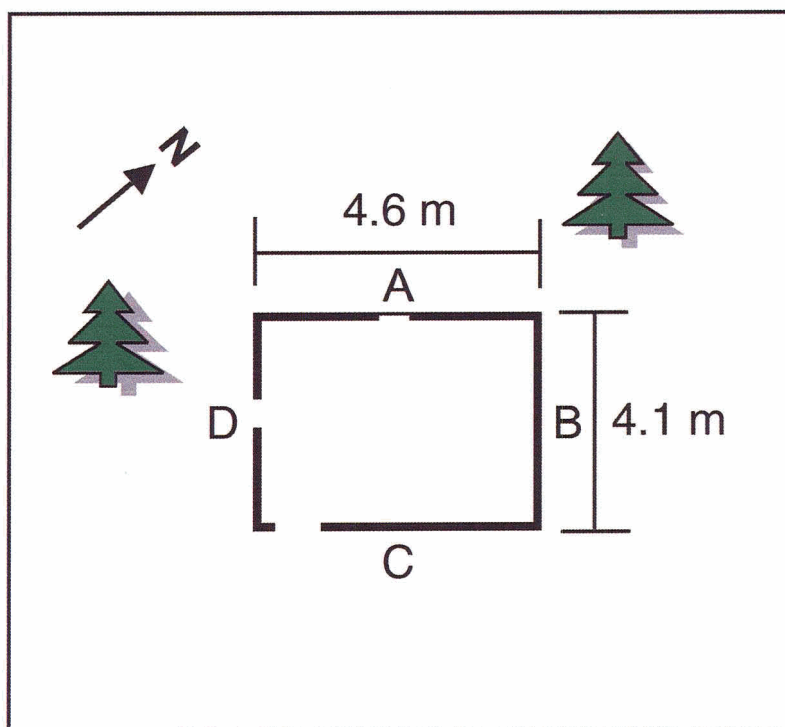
Glacier Trail Cabin dimensional drawing.
